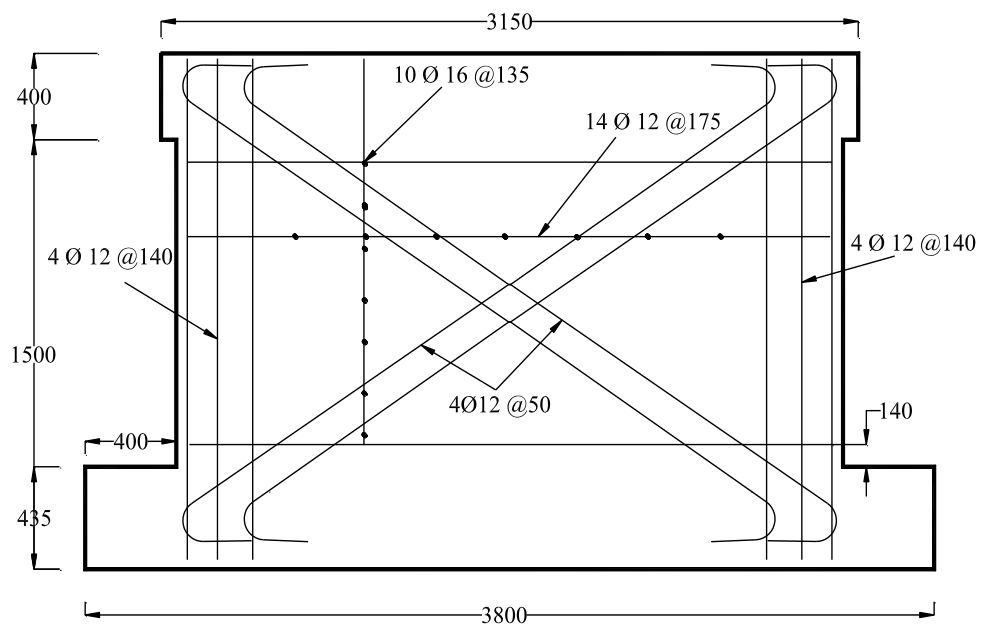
Reinforcement details in specimens tested by Paulay *et al.* (1982)
